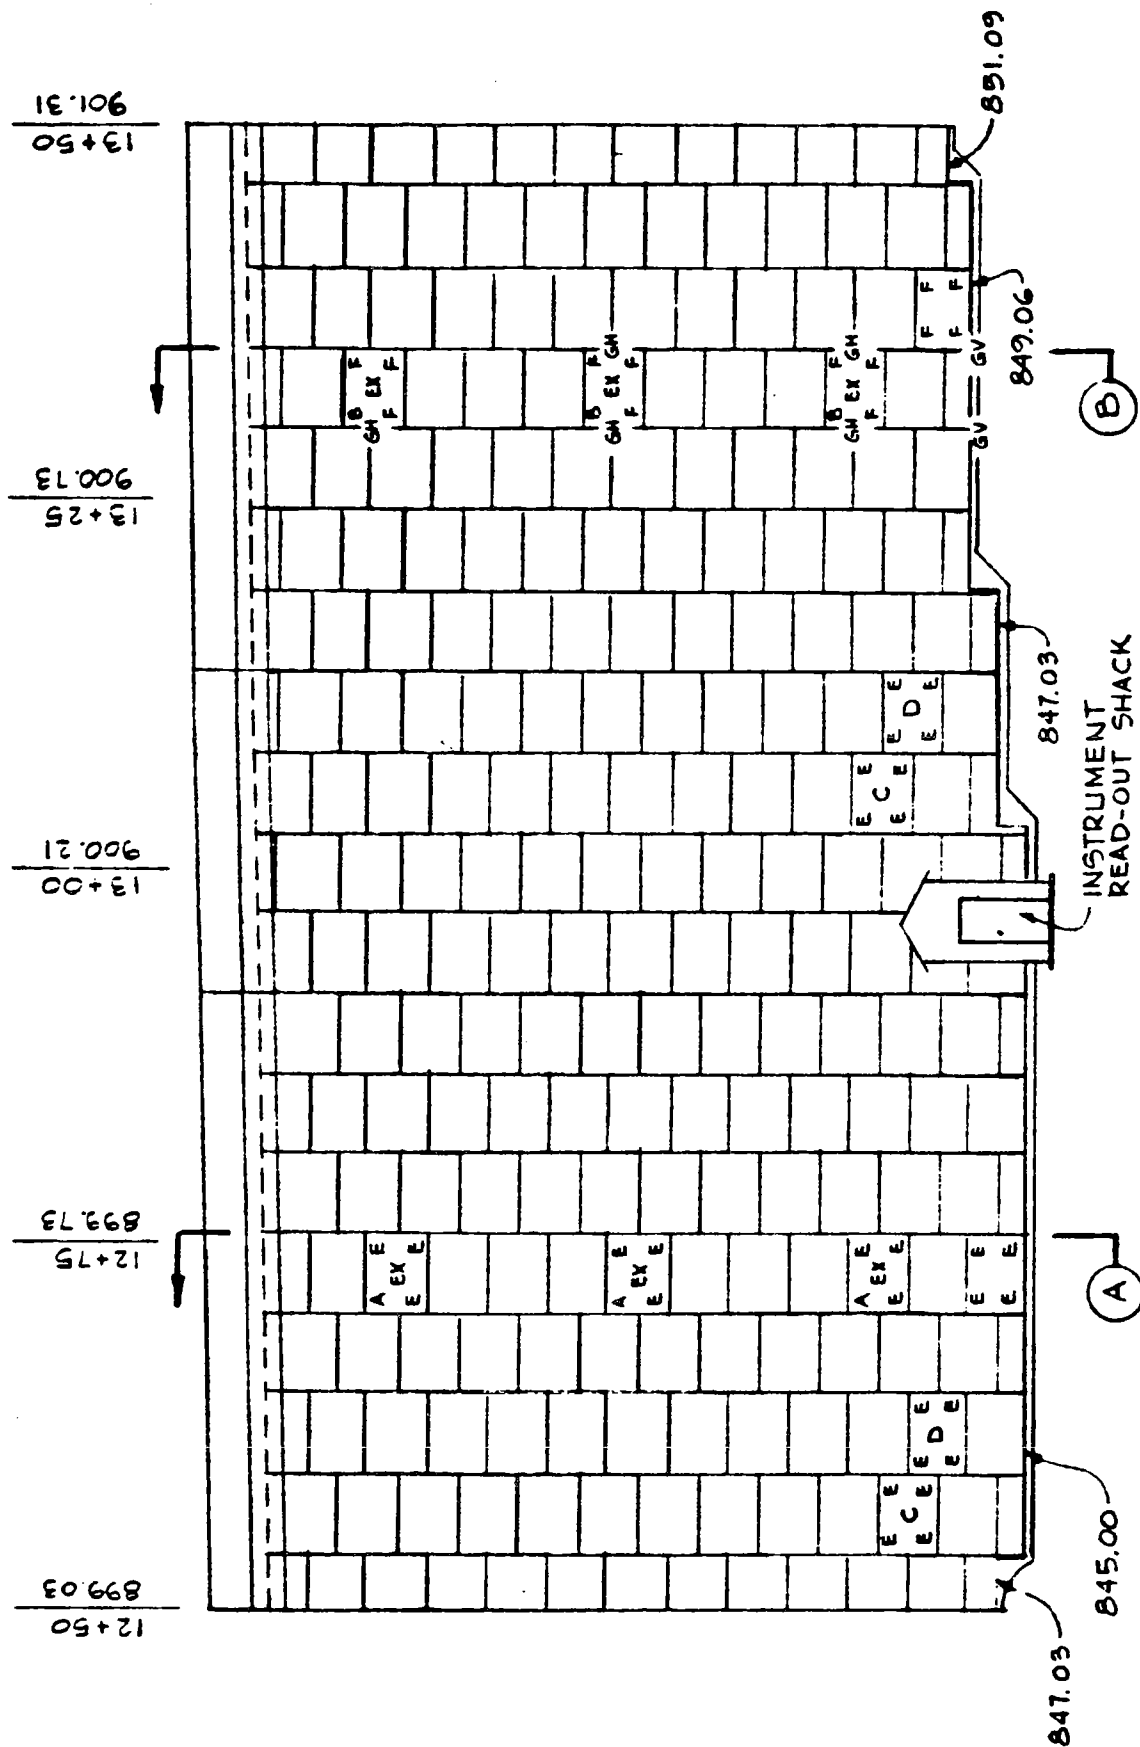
FRONT ELEVATION OF WALL SHOWING INSTRUMENTATION LOCATION
